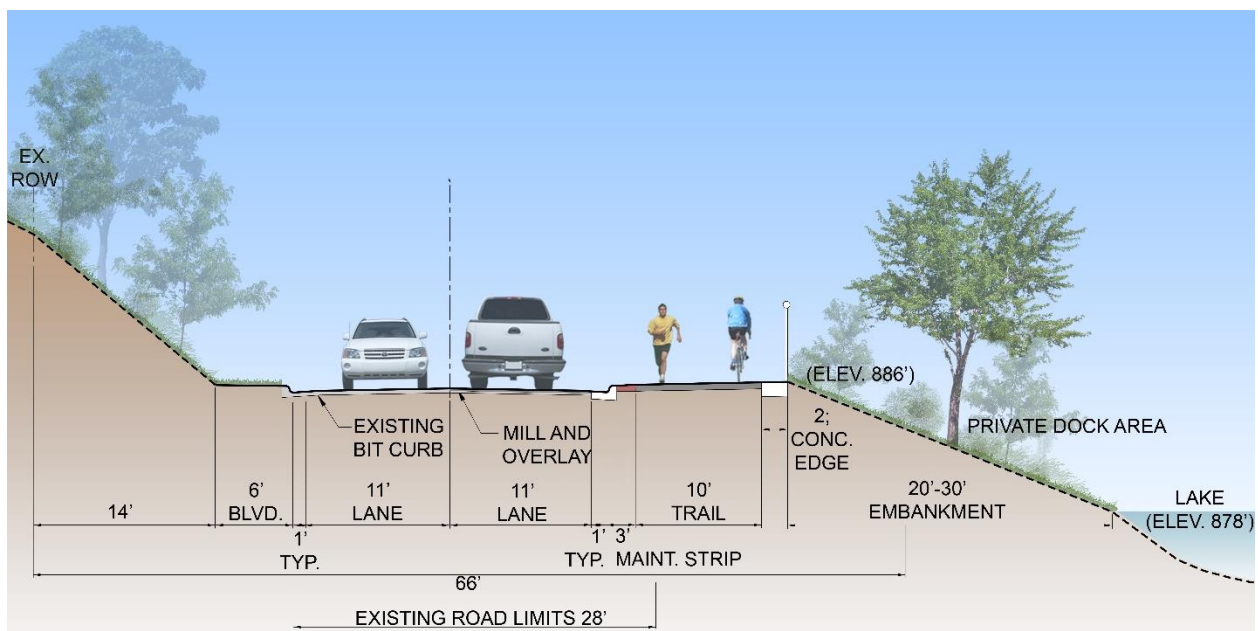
Typical Section B – Stowe Avenue to County Road E East Side Concept
